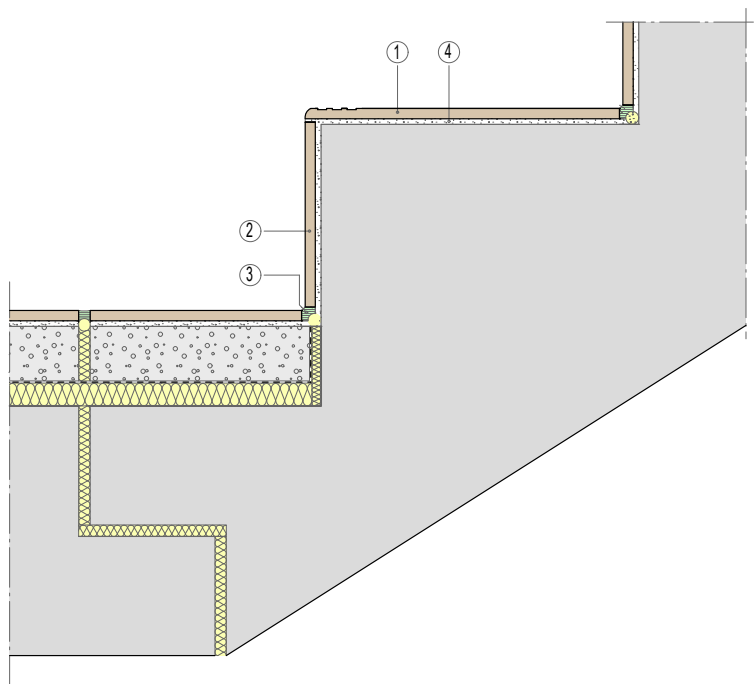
Prefabricated stairs with bearing surface insulated to reduce impact sound
